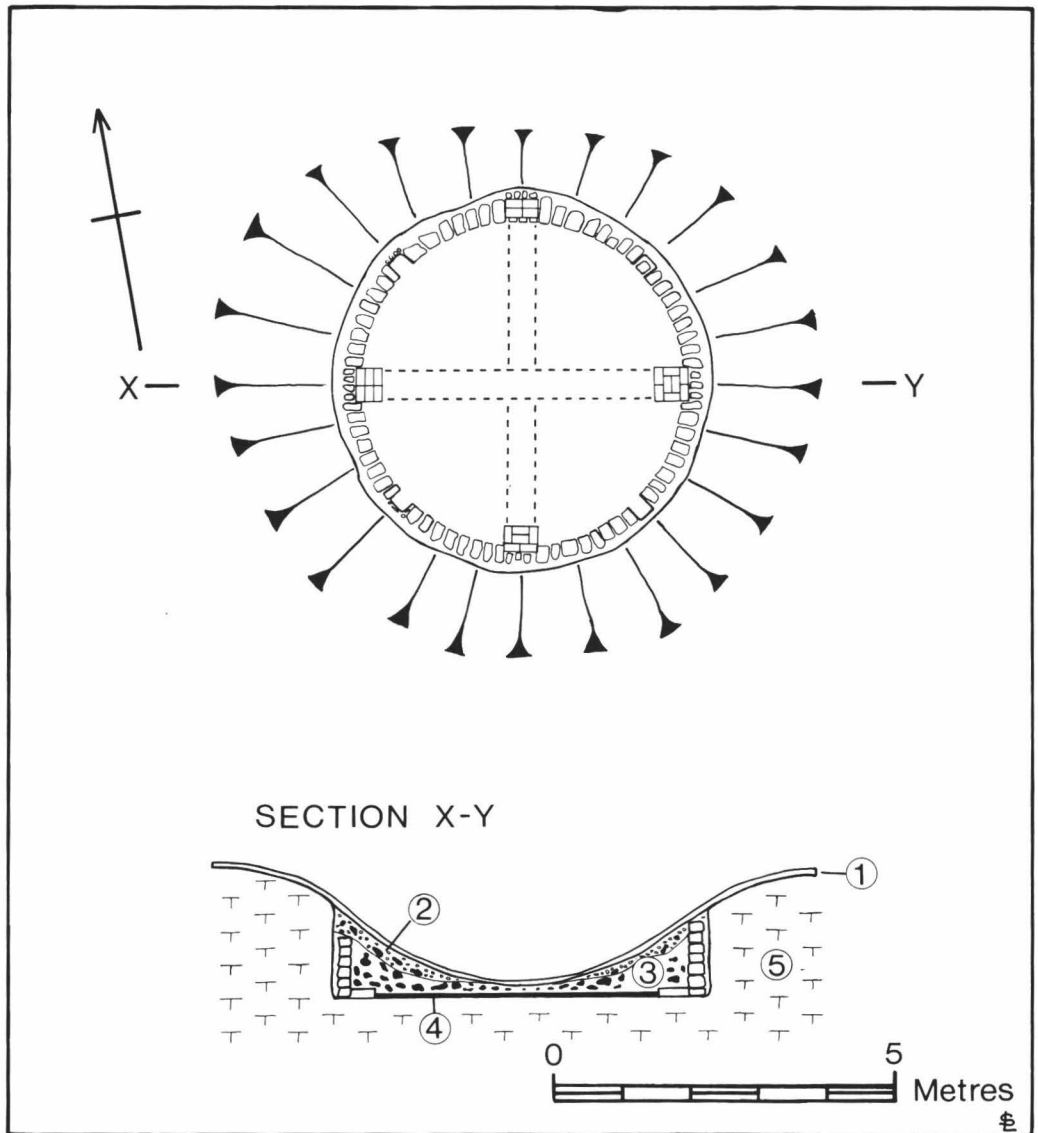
Plan and section of Pashley Down postmill (site 4). The plan shows the revetment wall of chalk and the position of the brick piers that once supported the cross-trees, whose original position is dotted. The section layers: 1. Turf and topsoil, 2. Earth and small chalk fragments, 3. Primary tumble of chalk blocks and field flint (black), 4. Dark soil with numerous finds above, 5. Natural chalk.
